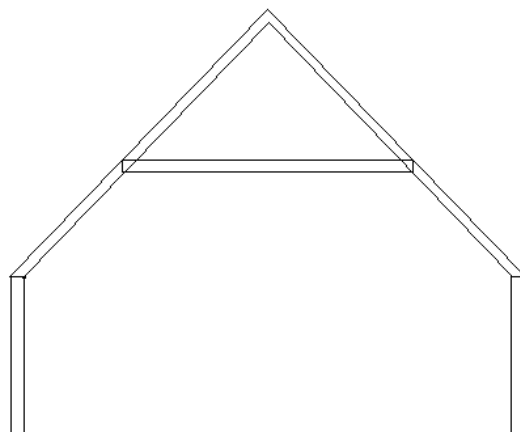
Simplified diagram showing the use of a collar beam to span the roof space.
